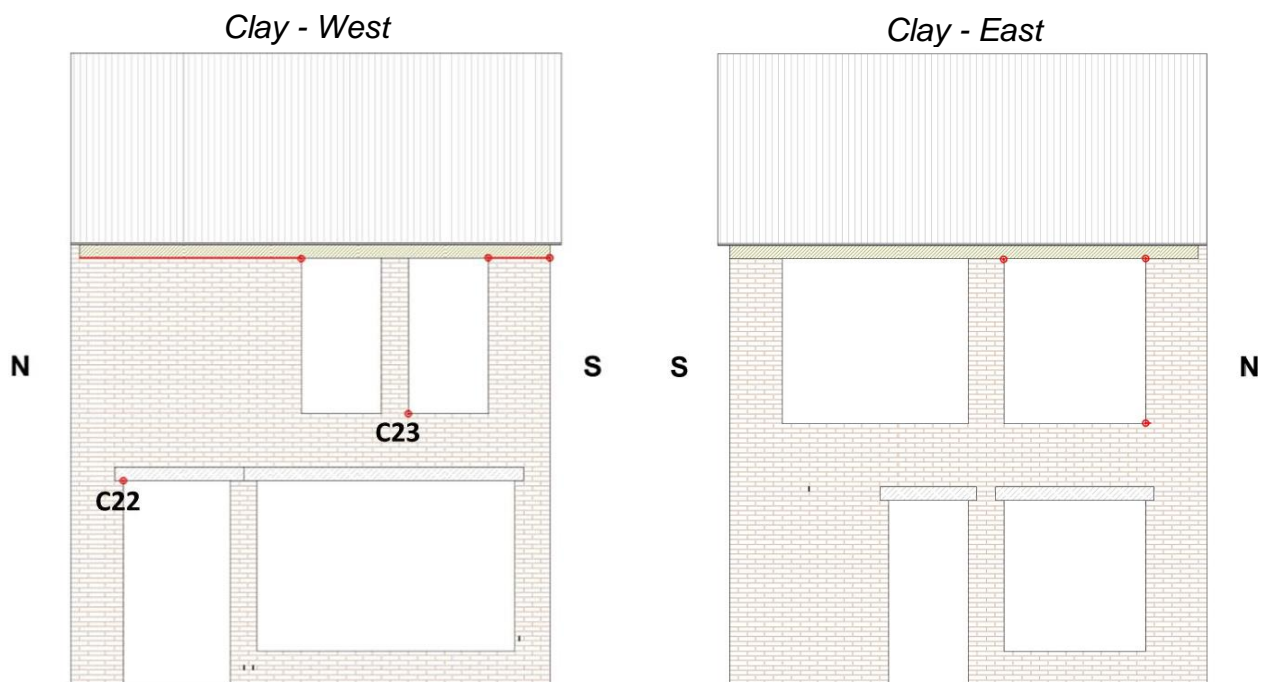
EQ-NPR 50% cracks – West and East clay façades.
